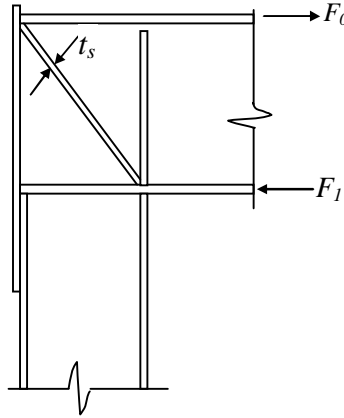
Forces and Stresses Assumed to act on Unstiffened Straight Corner Connection
